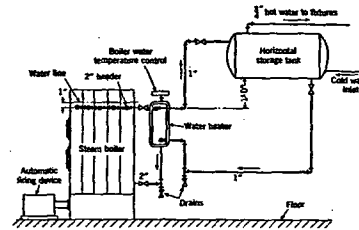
Indirect Water Heater Mounted on Side of Boiler
